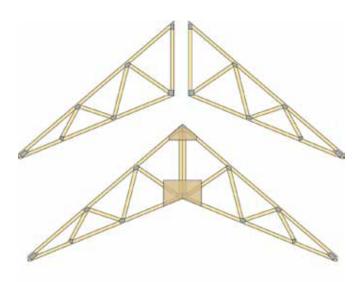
Example of a steeply pitched scissors truss requiring a specially designed field splice at the top and bottom peak joints.
